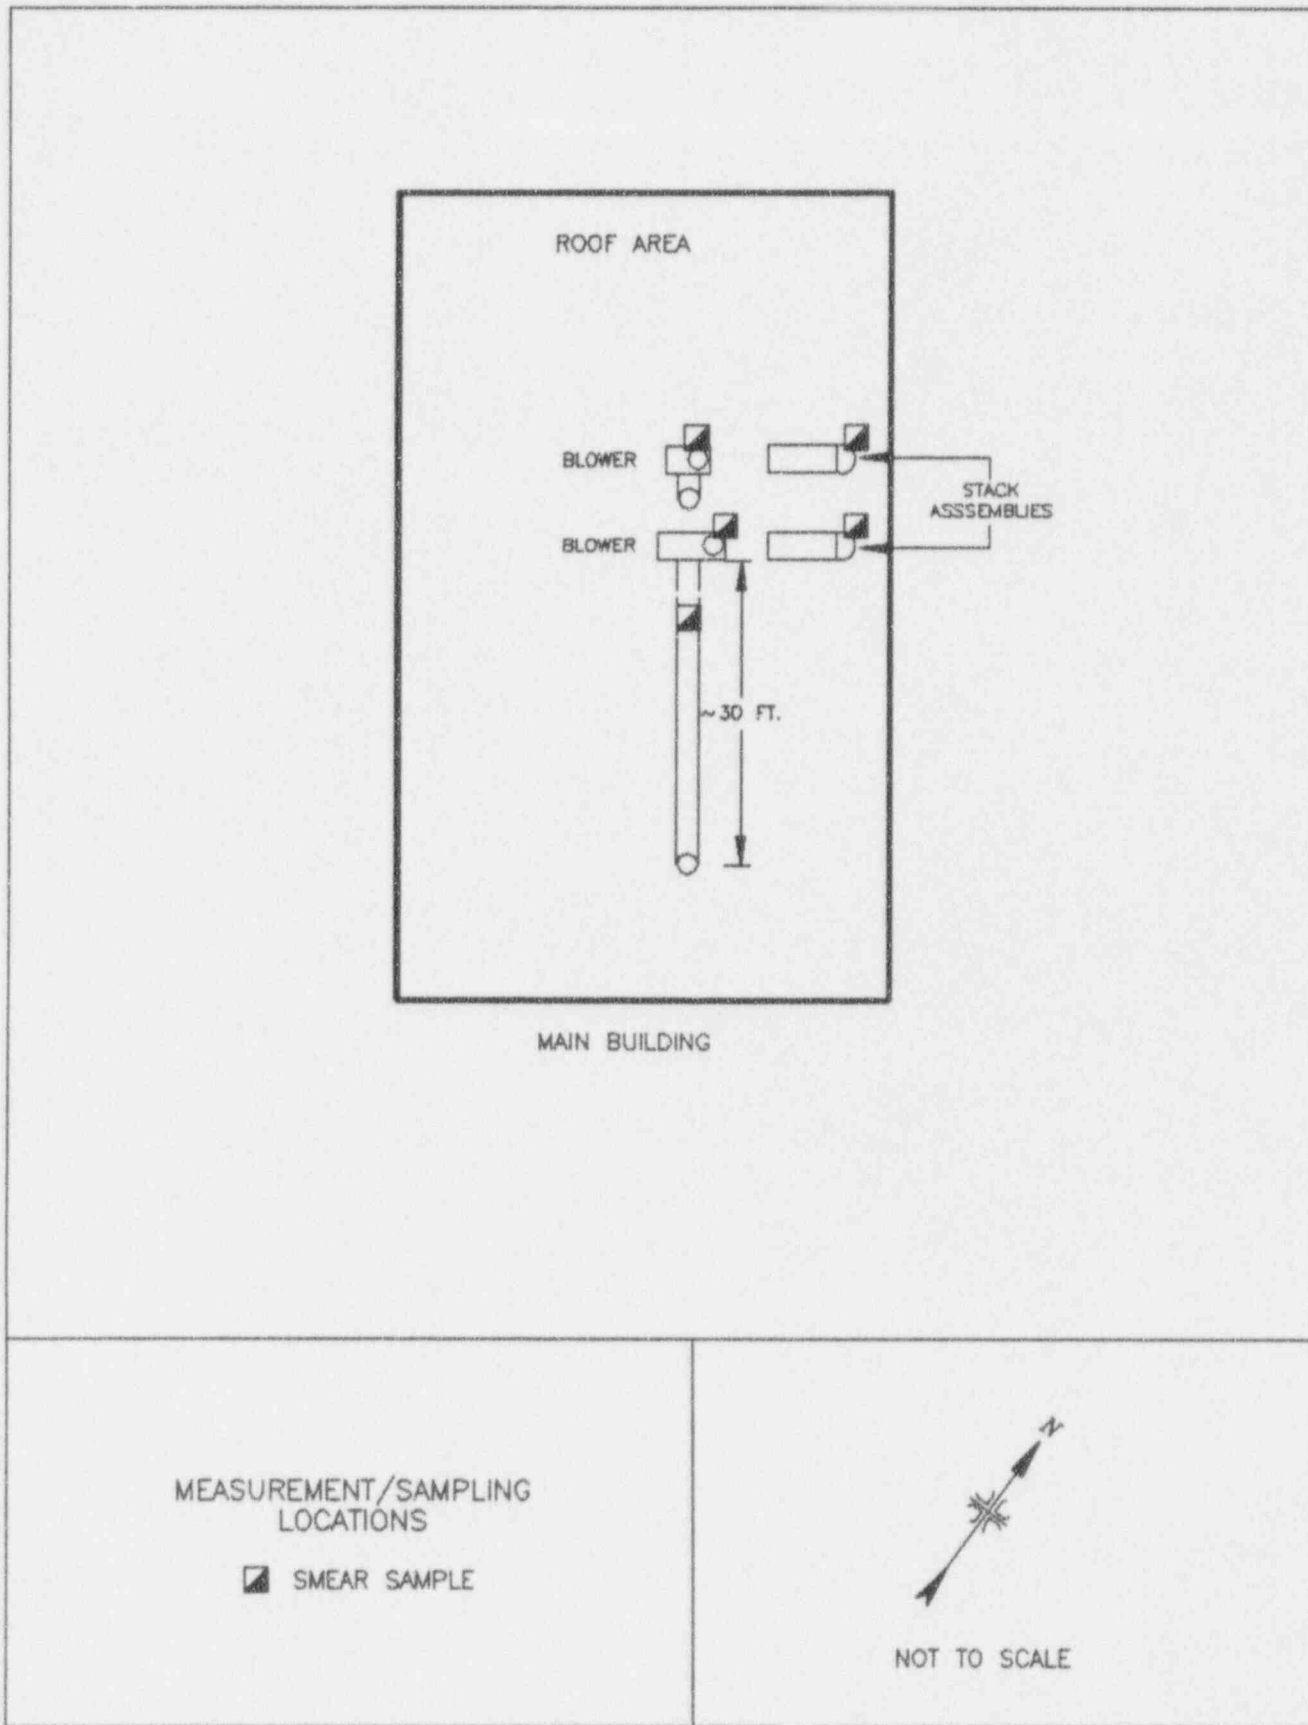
Building 1, Roof Area – Measurement and Sampling Locations
